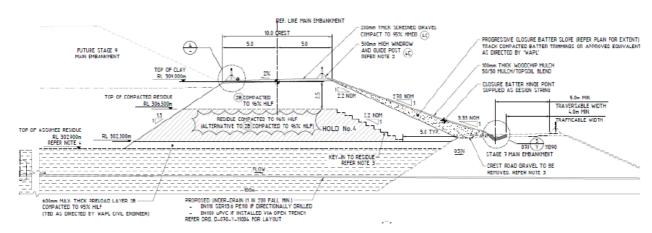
BRDA 4 Stage 8 Section View (Typical)
